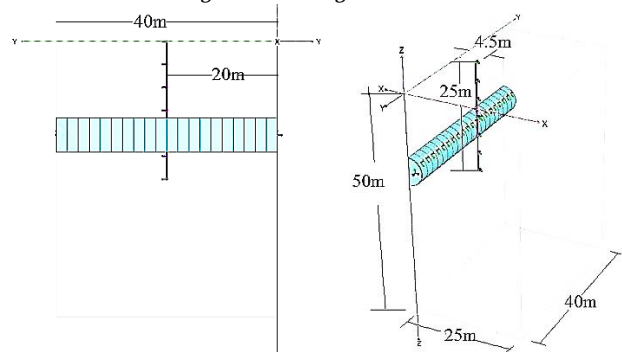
Numerical model of the open face tunnel excavation with single pile.
